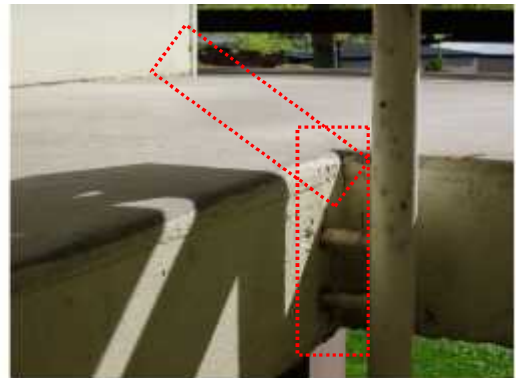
Block A – Crack in concrete slab - upper floor landing
